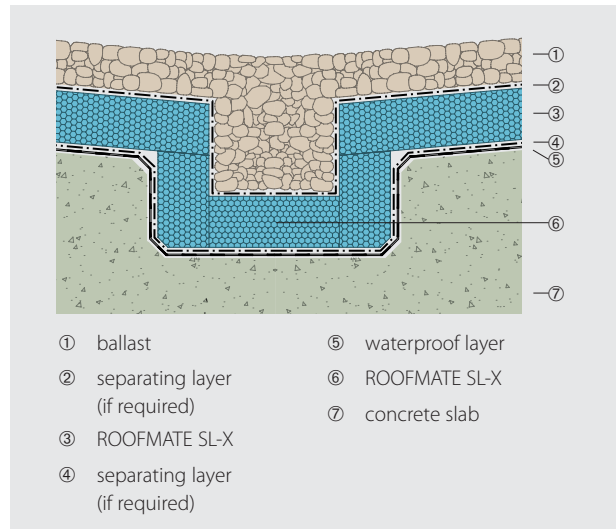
>> Ballasted inverted roof - insulation within internal gutter
